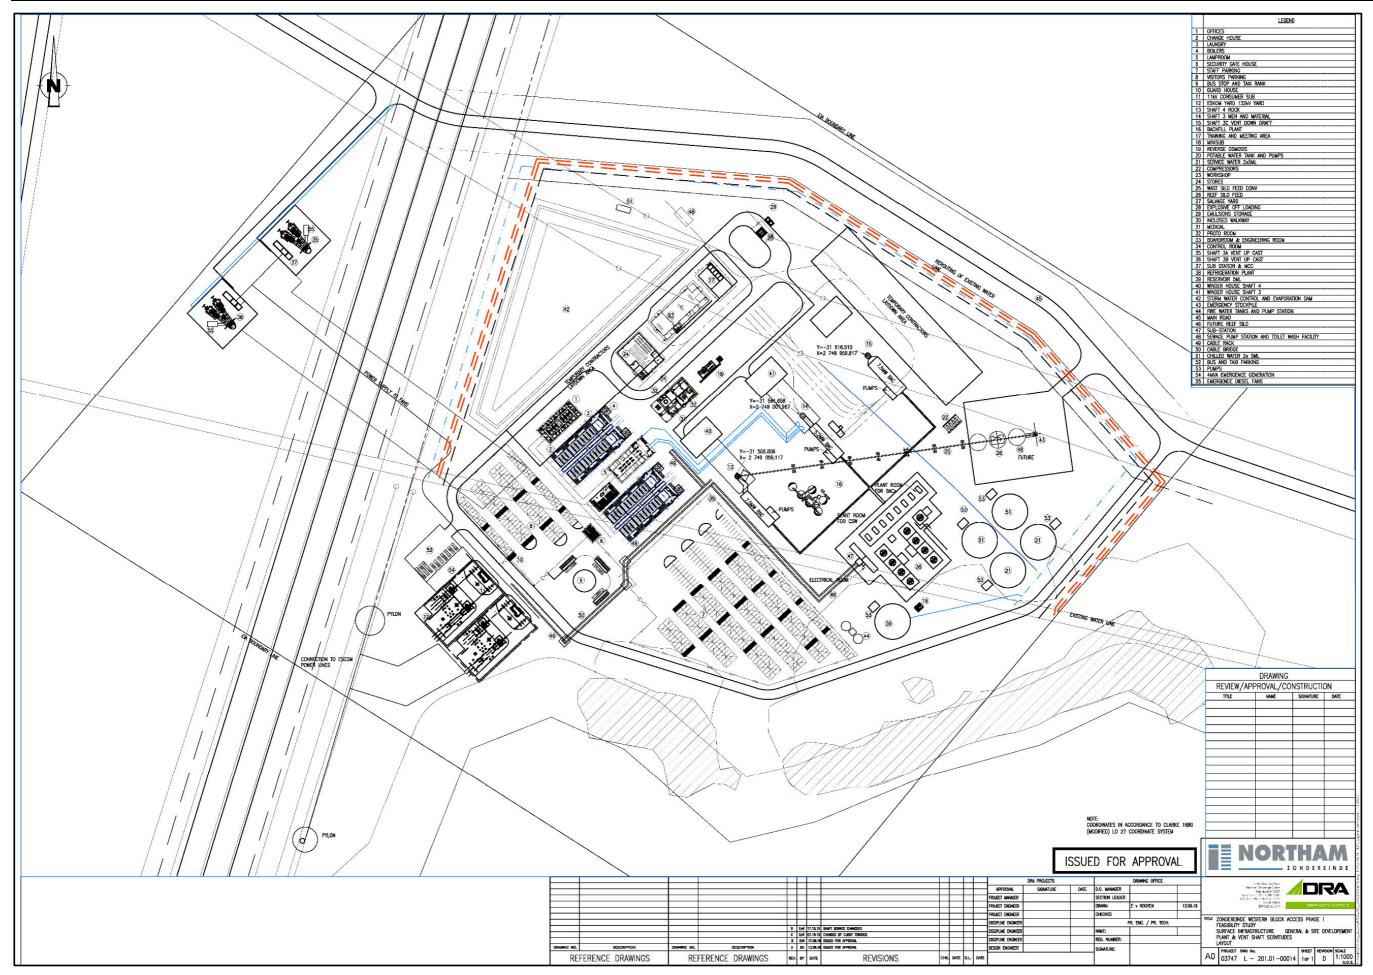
Northam Zondereinde 3 Shaft Proposed Layout
